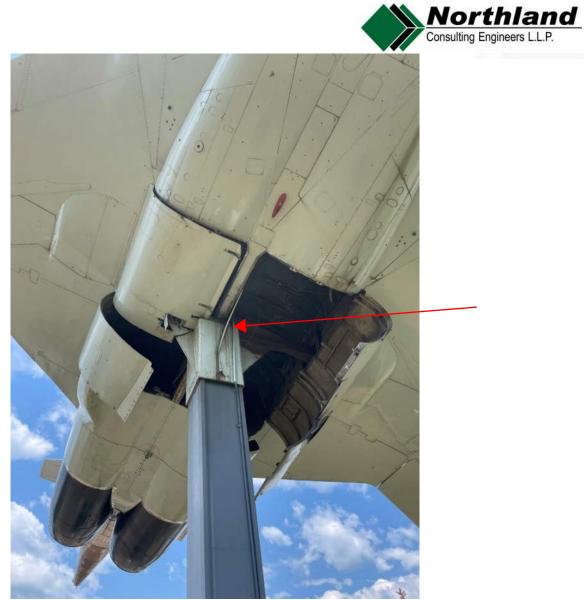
Exterior – This photo was taken from the ground on June 12 th , looking west, - note the bent east side gusset plate – foreground.
